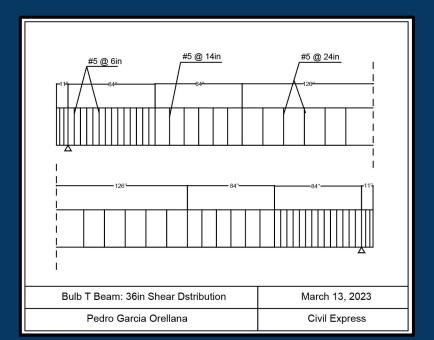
Bulb T Beam Shear Reinf. Middle Section.
